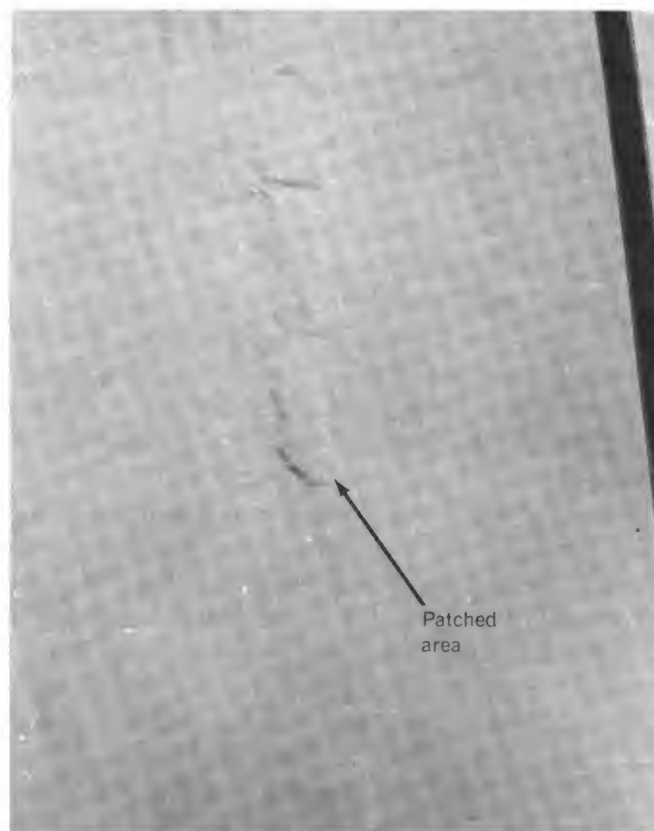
All Phase Color. North wall, looking from outside the building. Though repaired, damage inflicted by displacement of interior wall is evident. Wheeler & Gray photograph.
